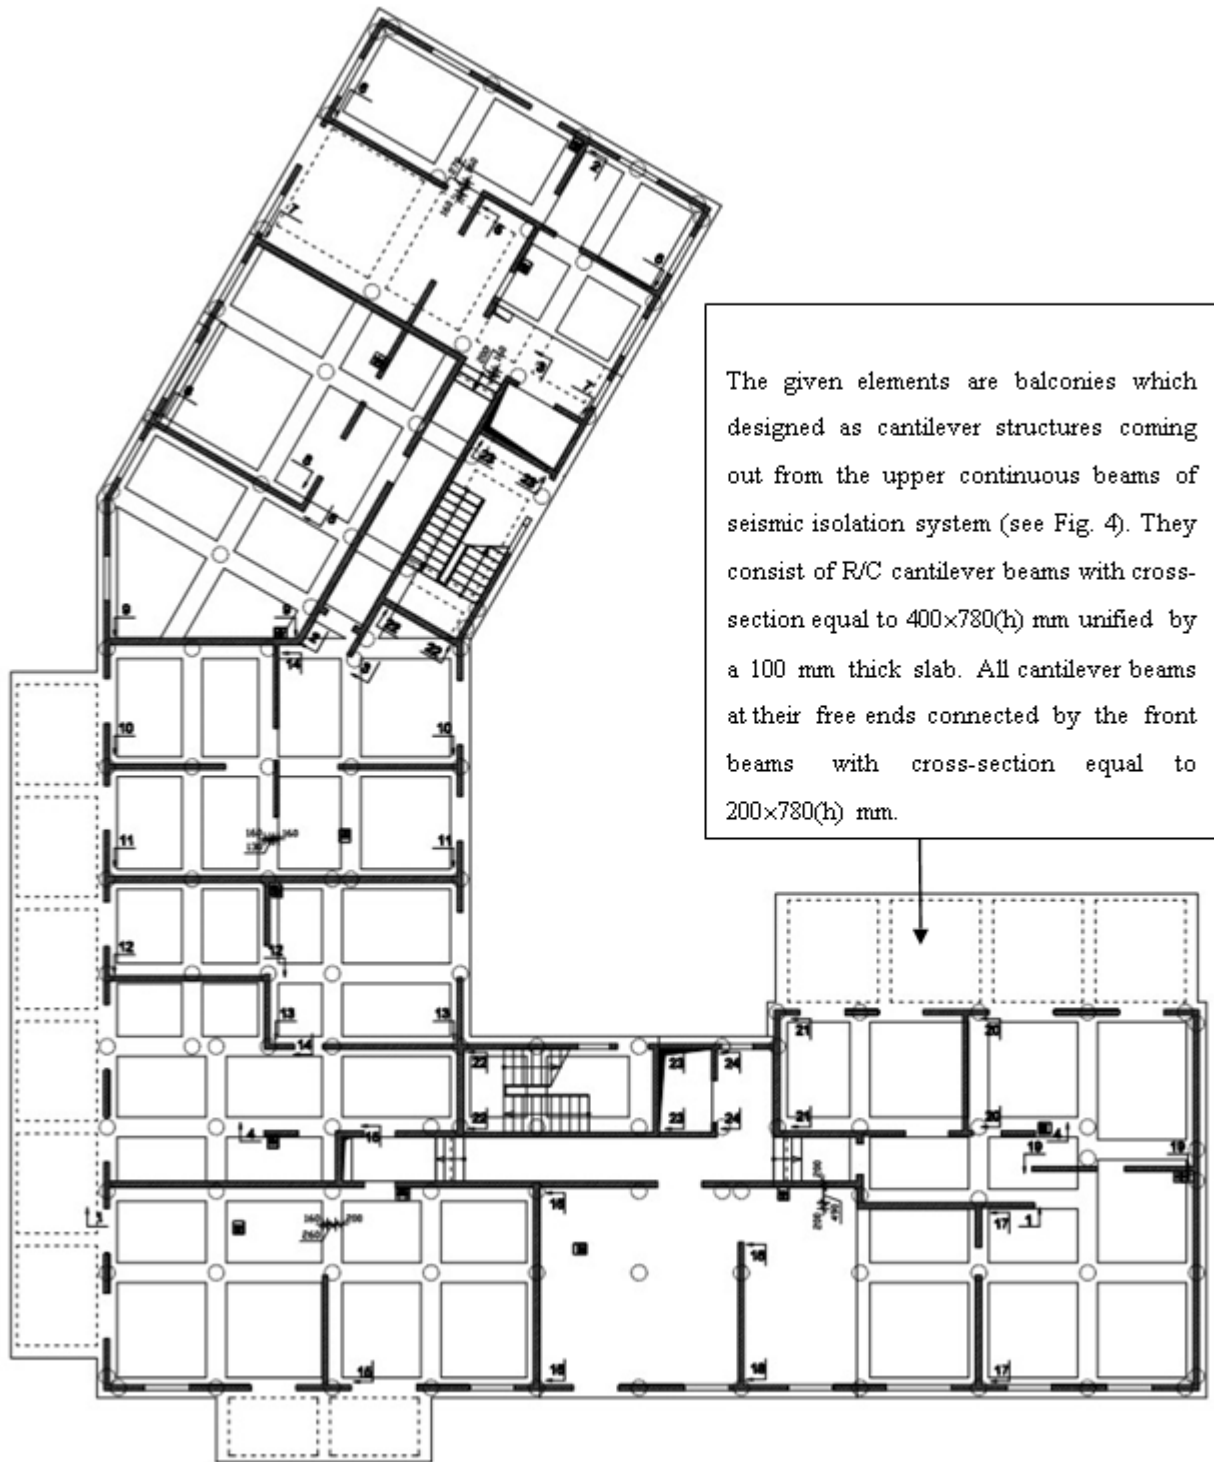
Plan of location of the first floor’s R/C monolithic load-bearing walls on the upper beams of seismic isolation system of the 7-story apartment building “Stepanakert-Sections-4-5”
